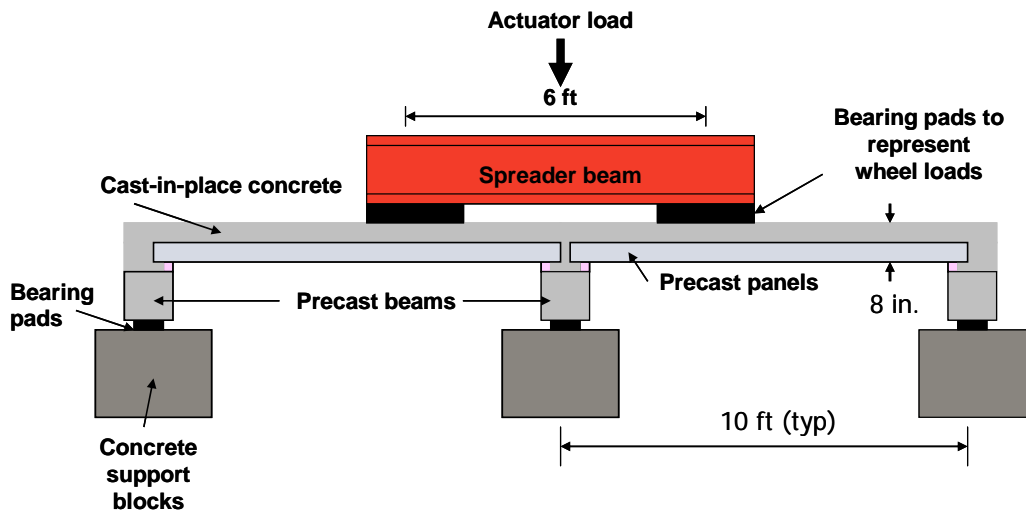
Cross Section View of Negative Moment Specimens (Not to Scale)
